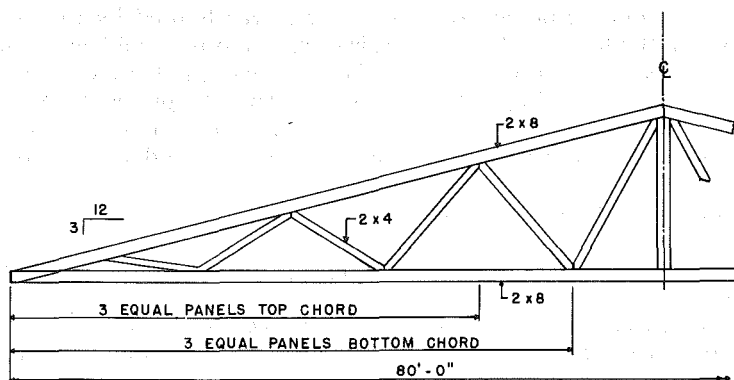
Warehouse Roof Truss (1 in. = 25.4 mm)
